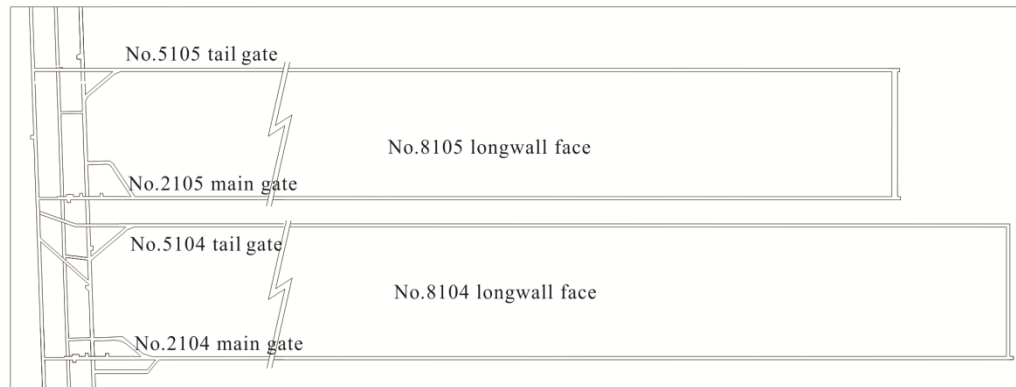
Layout of No.8104 and No.8105 longwall faces
